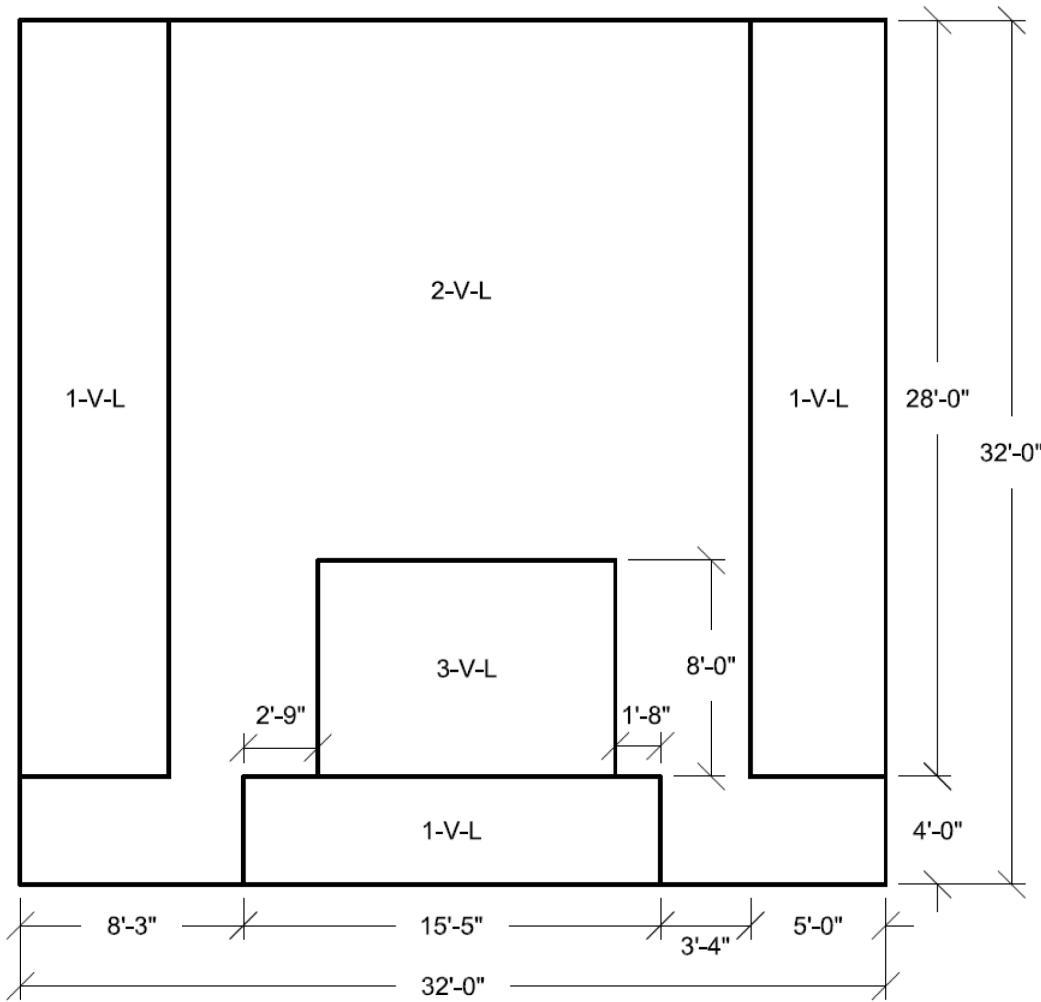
H.6-186 DGFOSV Wall 12 Looking From Outside Vertical Reinforcement Zones Near Side Face
